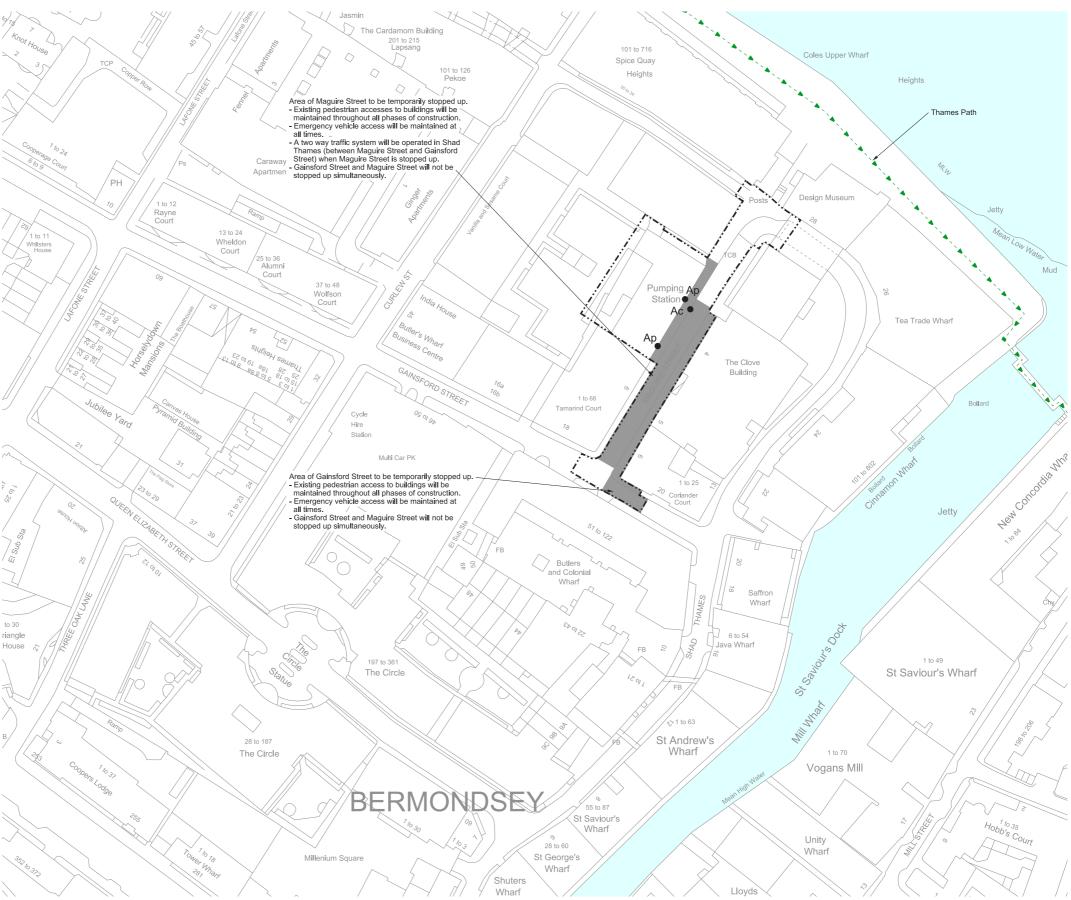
Access plan - refer to the Access plan in the Book of Plans
